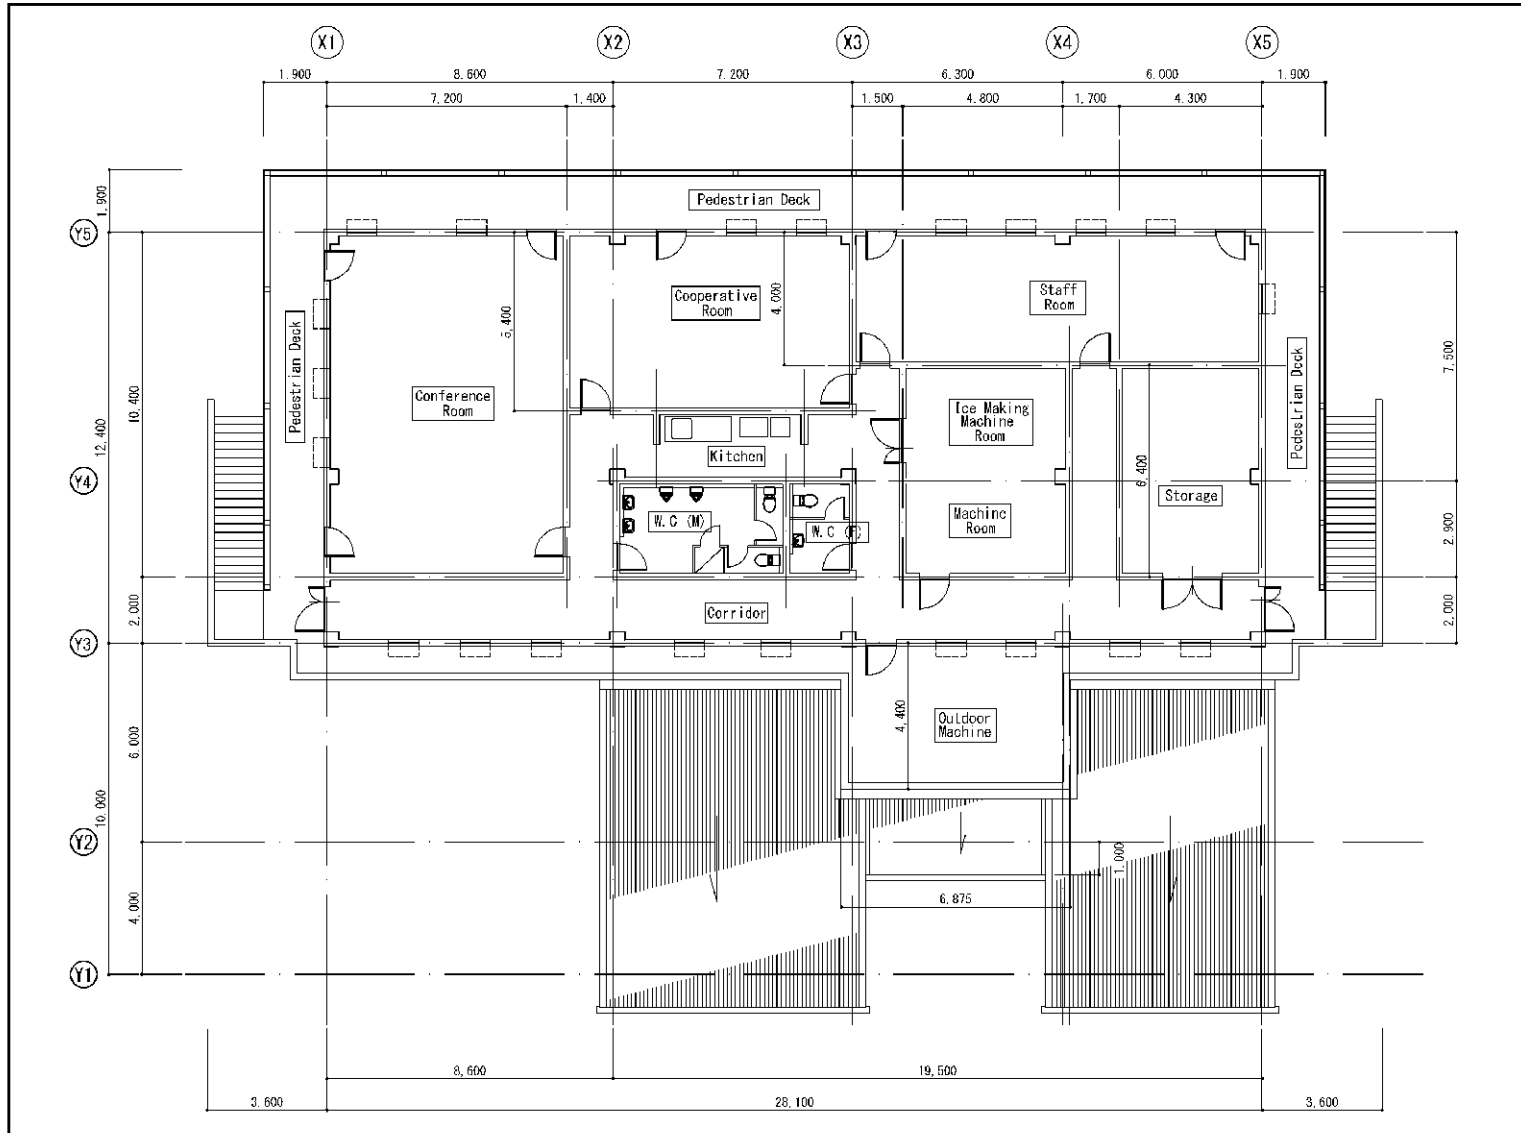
(7) New Fisheries Center (Second Floor Plan)
